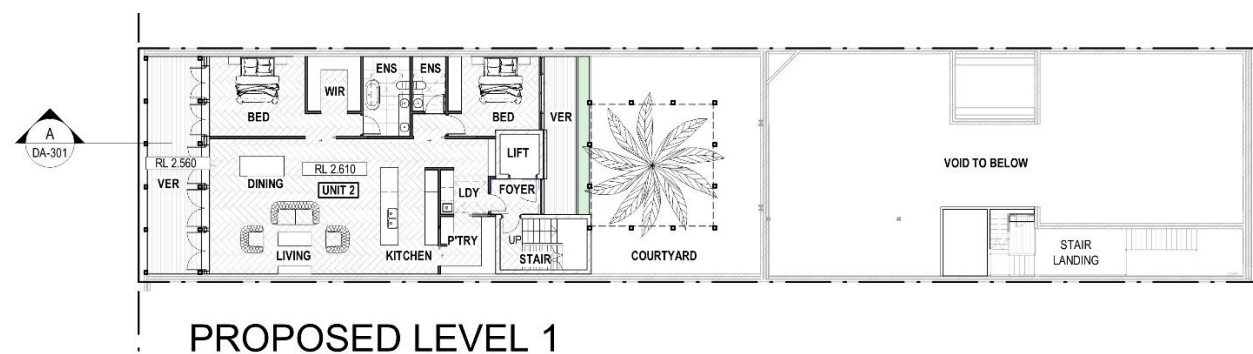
Proposed Level 1 Floor Plan showing the reinstatement of the original ceiling level within the former banking chamber – indicated with “Void to Below” designation – and showing the mid-level landing of the entrance staircase adjoining. The rear wall of the (former) Bank building is retained with the open courtyard space immediately behind same. The rear portion of the subject site will accommodate a new residential unit with stair access to the carparking below and a verandah overlooking the rear site frontage to Quay Lane. (Source: Feather & Lawry Design)
